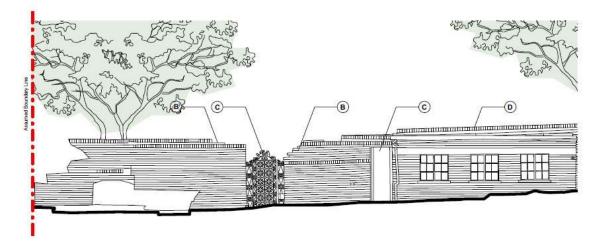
Existing rear elevation as viewed from No.20 Perrin's Walk
